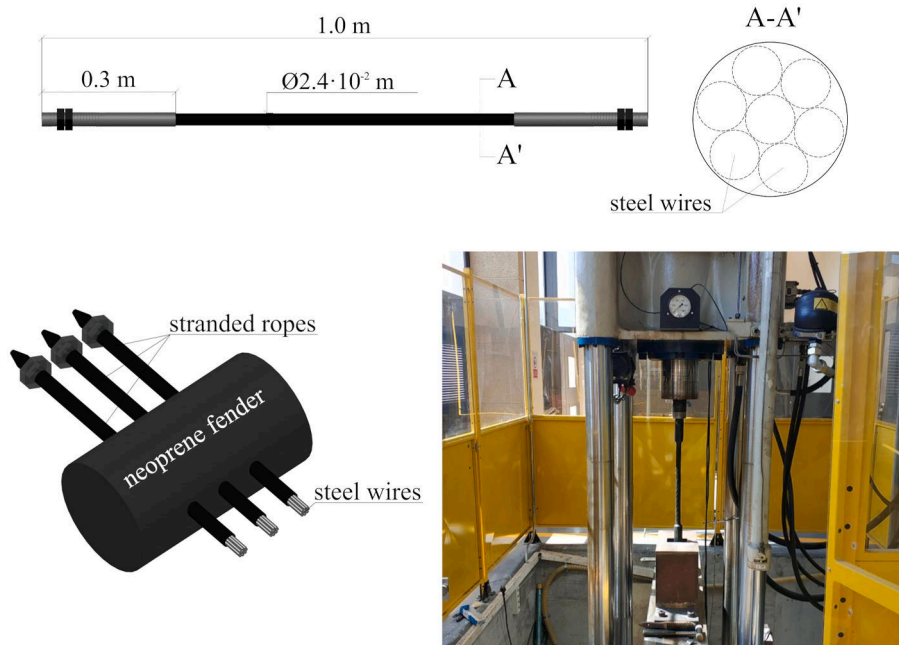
Detail of semi-rigid connections for the studied floating breakwater and conceptual scheme of the stranded rope (upper and left panels). Breaking load test (right panel).
